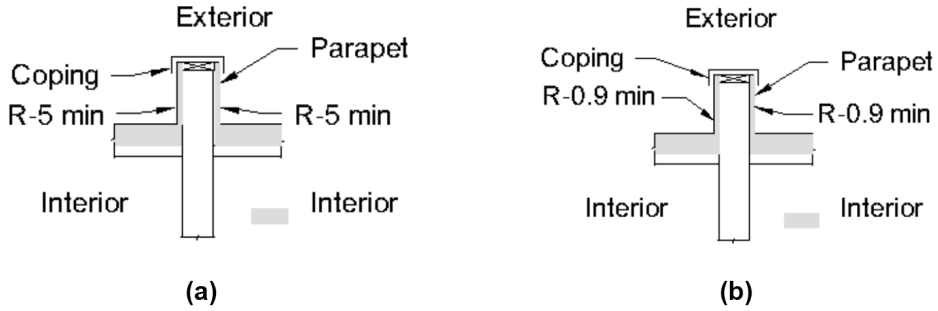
Parapet within field of roof (a) I-P and (b) SI (Section 5.5.5.1.3).
